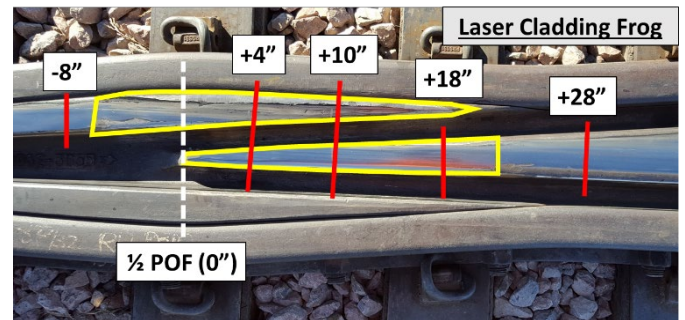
Locations of weld repairs and profile measurements from 5/8-inch point of the laser cladding frog
